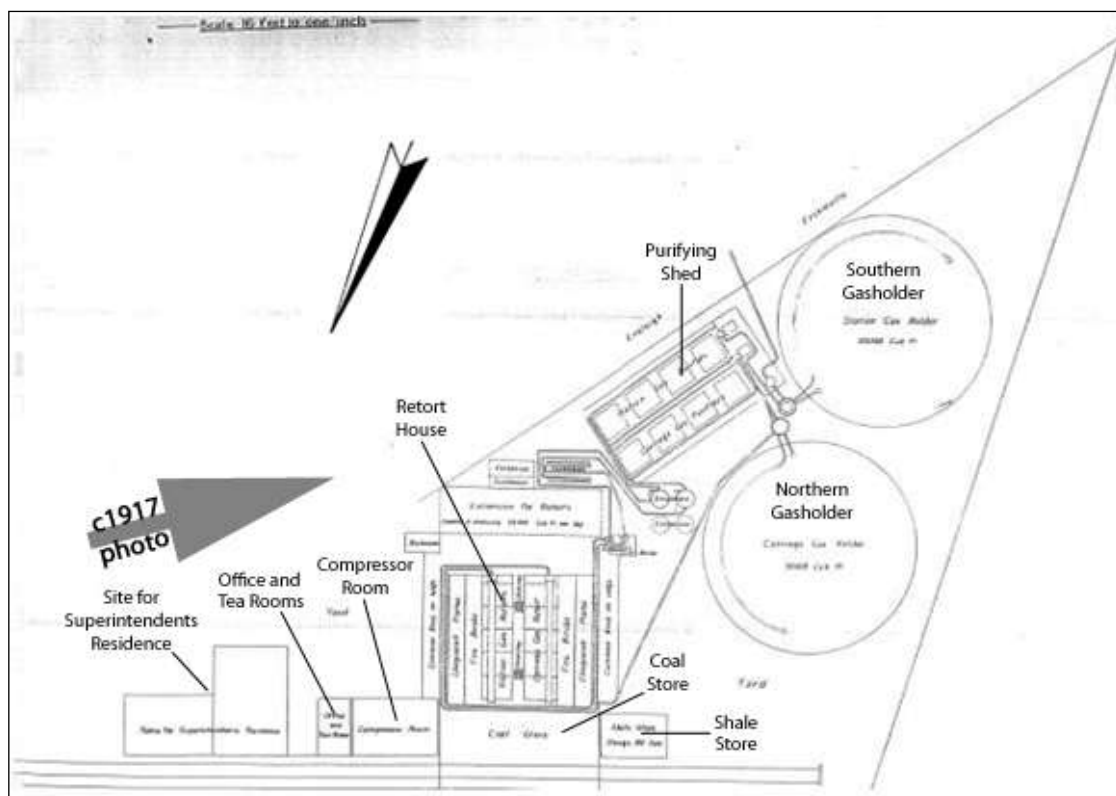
The Gas Works Eveleigh General Arrangement, plan c.1917. This plan names each section of the structures on the site, which have been highlighted with arrows. It dates from the same period as the photo on the previous page at Figure 4.
